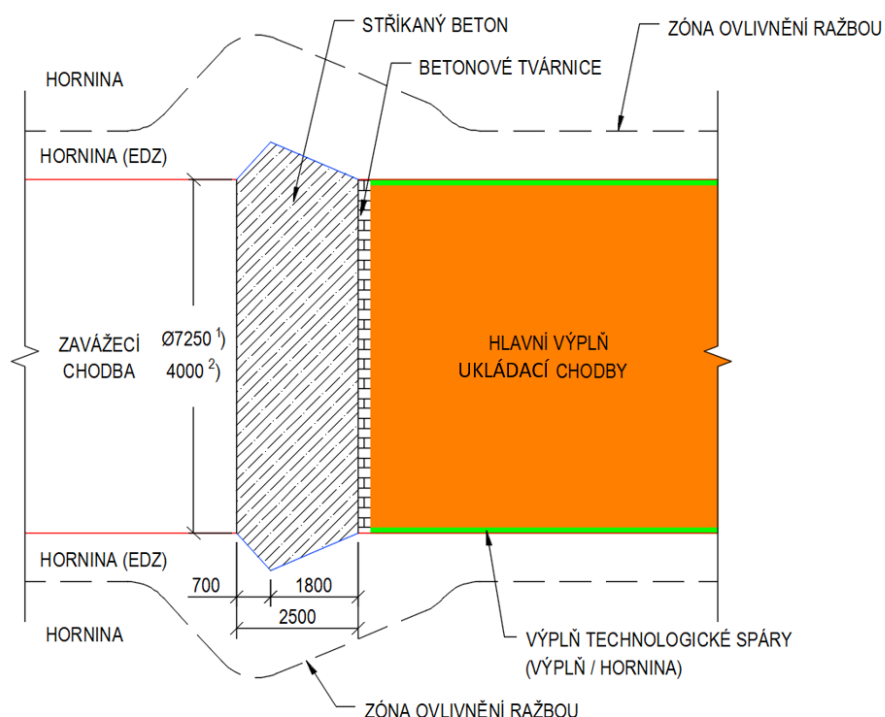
Diagram of the disposal corridor plug; monolithic concrete may be used instead of shotcrete (Svoboda et al. 2022)
